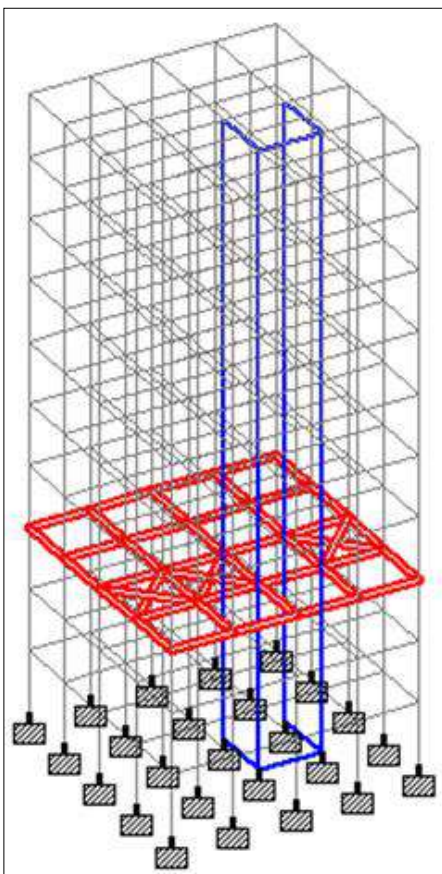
Model-I: Outrigger at second floor with core wall (EQ-2)
